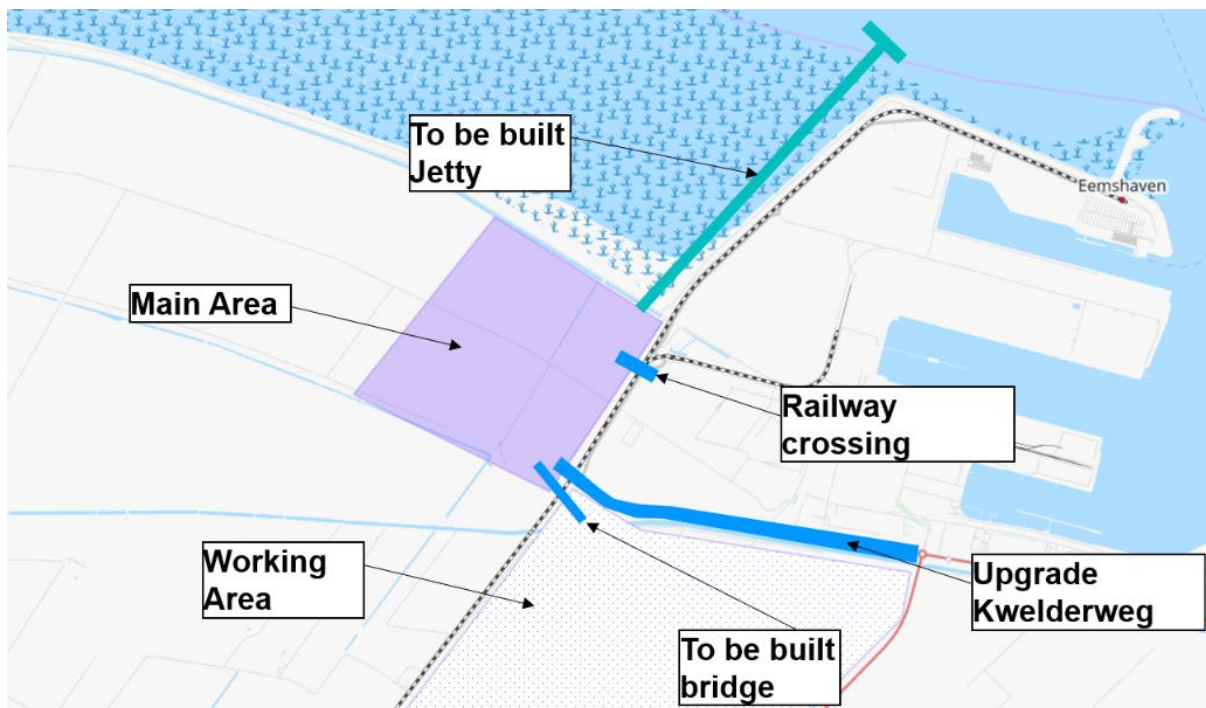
Modifications to existing infrastructure (blue: road infrastructure, green: port infrastructure)
